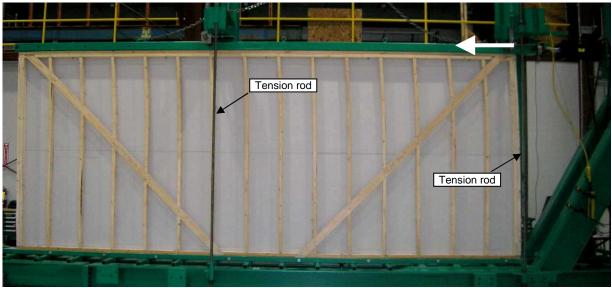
Shear Wall Test Specimen (Configuration 4, full E-72 restraint)
